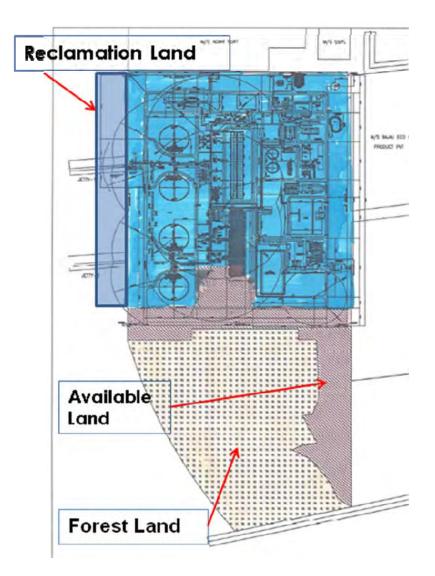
LAND REQUIREMENT DETAILS
